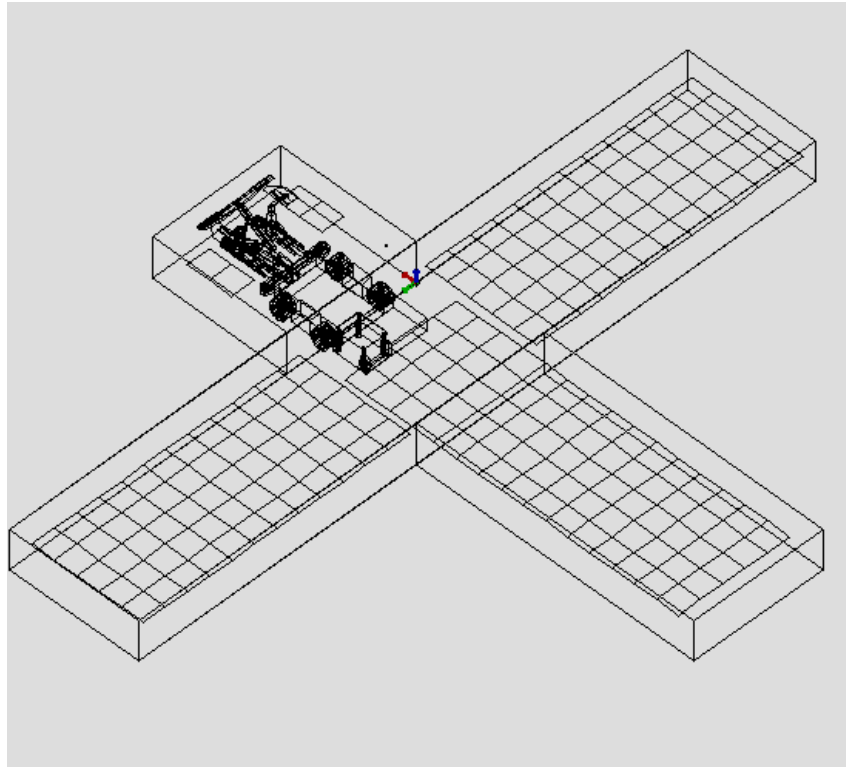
Measurement Grid Developed for a Roof Bolting at the Mine Face
